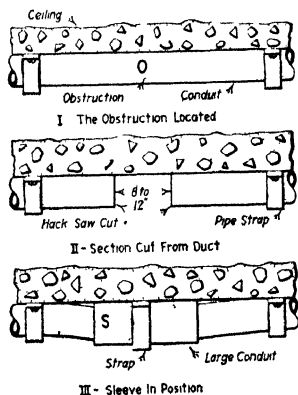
Method of opening and repairing choked conduit to remove obstruction.
